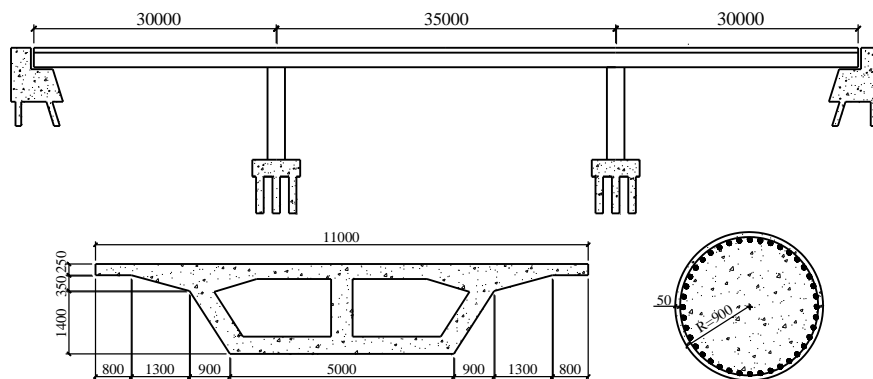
Elevation view and the cross section diagrams of the example bridge (unit: cm, not to scale)
